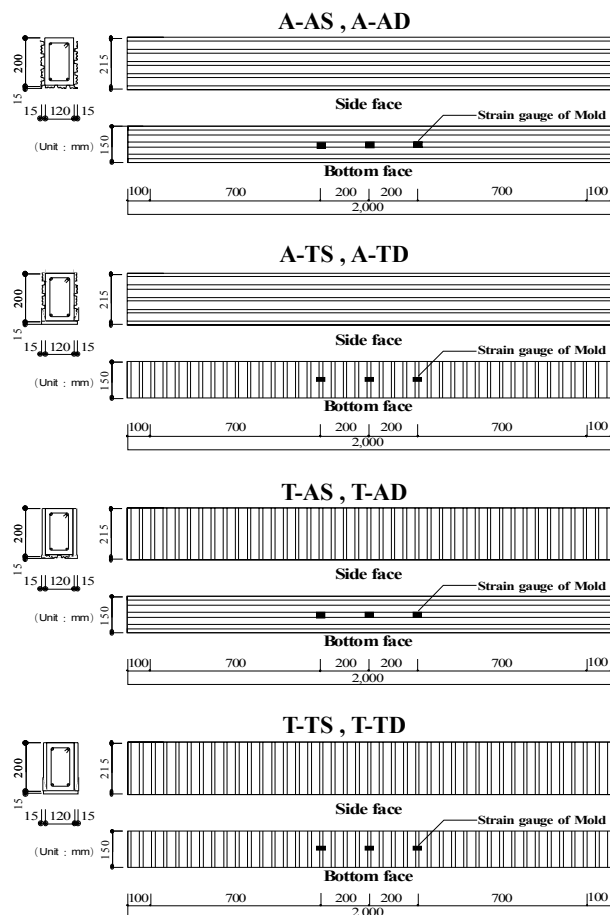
Arrangement patterns of permanent steel forms for RC beams
